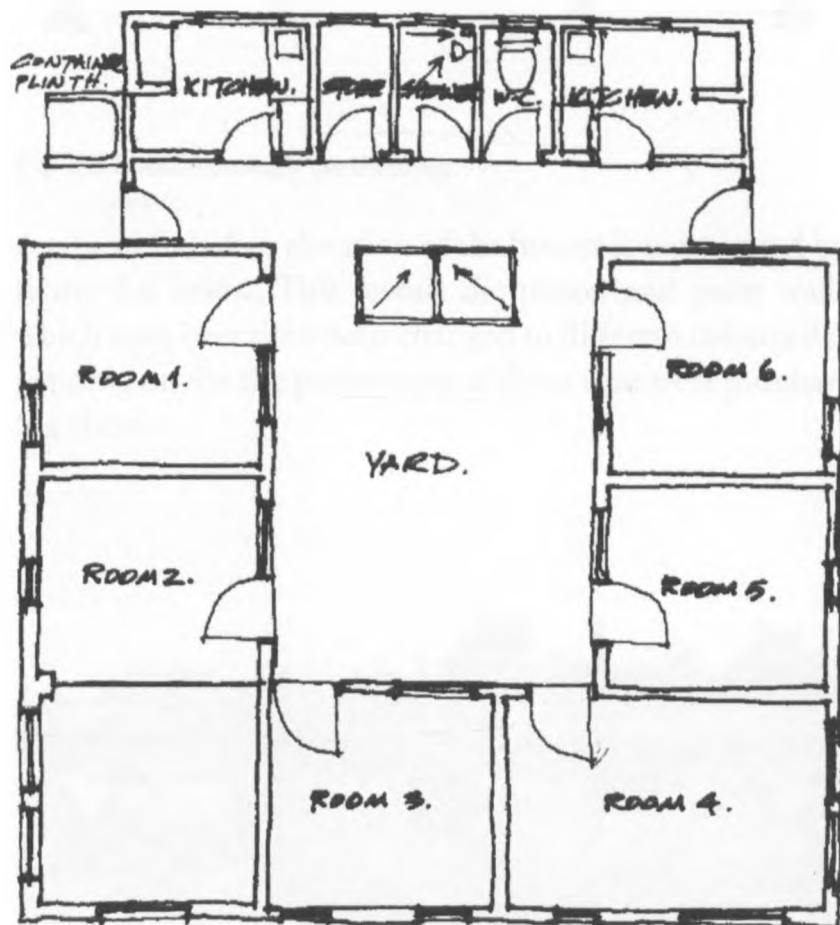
Typical Floor Plan of the Karanja Road Houses.
